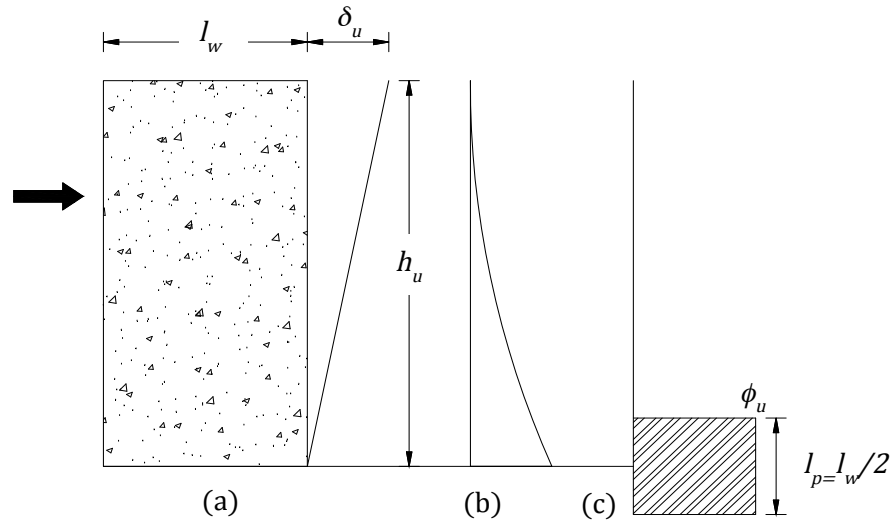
Wall flexural deformations: (a) elevation, loading and drift, (b) moments, (c) curvatures.
